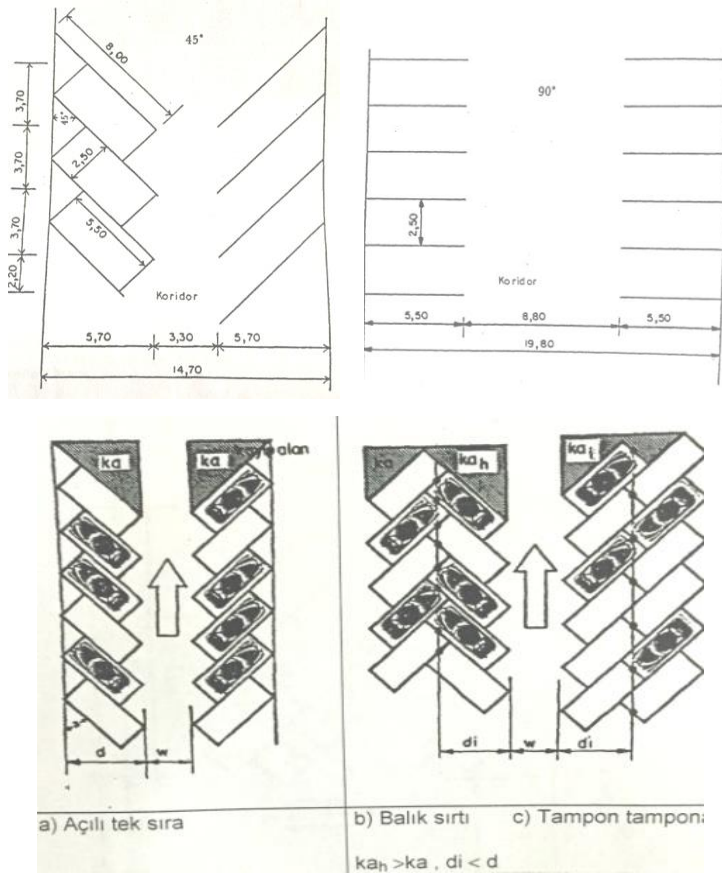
Parking aisles and stalls layouts (Turk Standardlari,1992).
